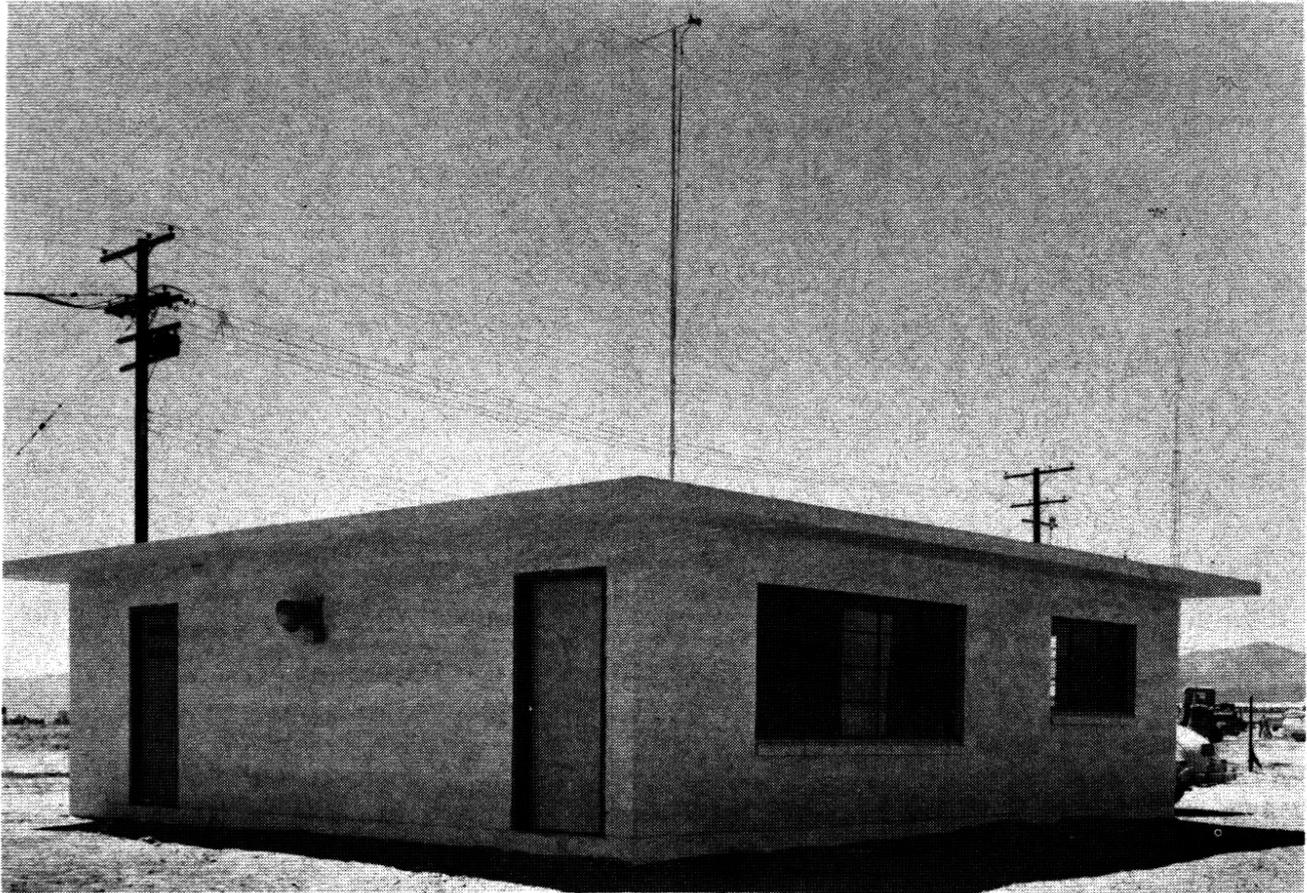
Reinforced masonry-block house before a nuclear explosion, Nevada Test Site.
